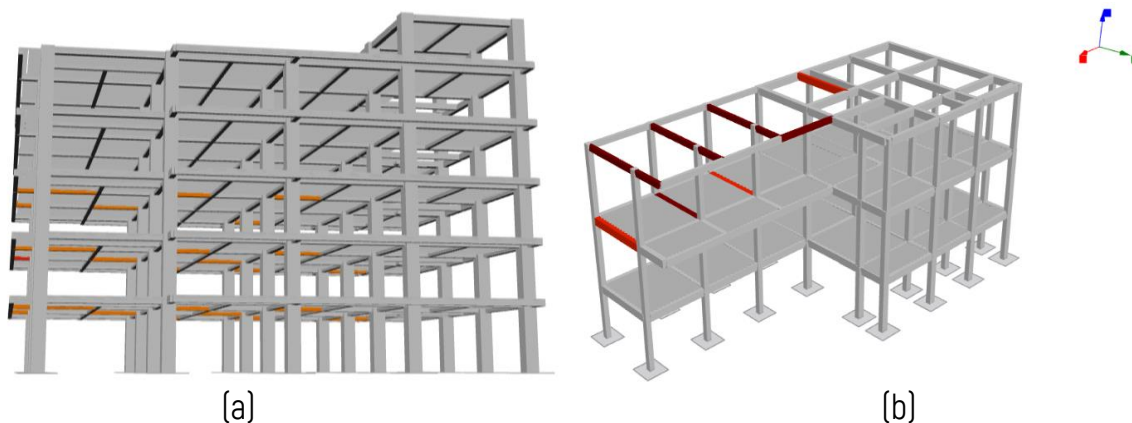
Location of structural member failure per member shear forces of (a) soft-story building at OL and (b) re-entrant building at CP.
